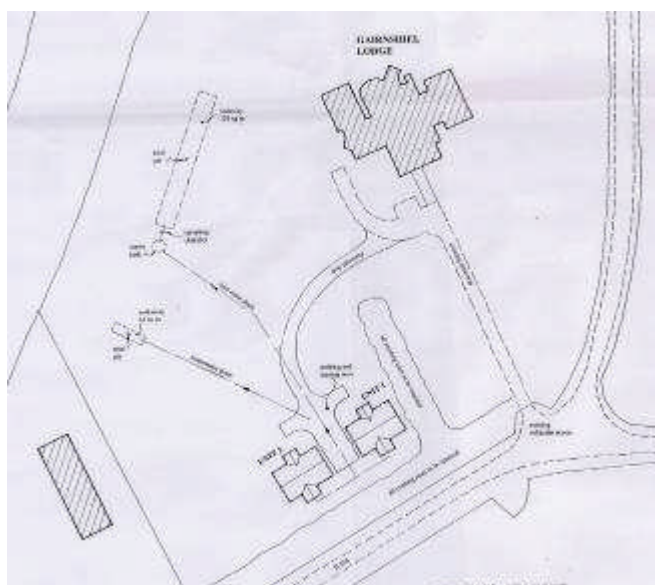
Holiday cottages and access arrangement : approved site plan
